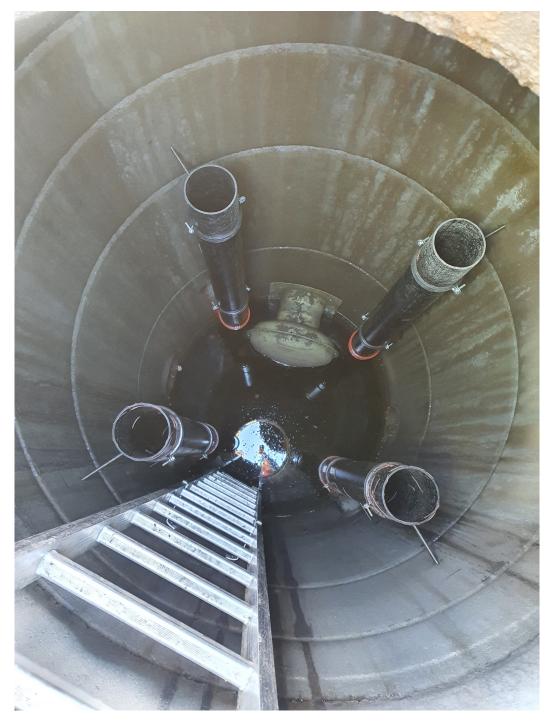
The manhole downstream the detention basins in the field pilot. The four vertical pipes are connected to the infiltration pipes as an outlet if the detention basins go full, and the swirl chamber regulates the outflow from the detention basins. Photo credits: Ida Hovland Haveraaen
